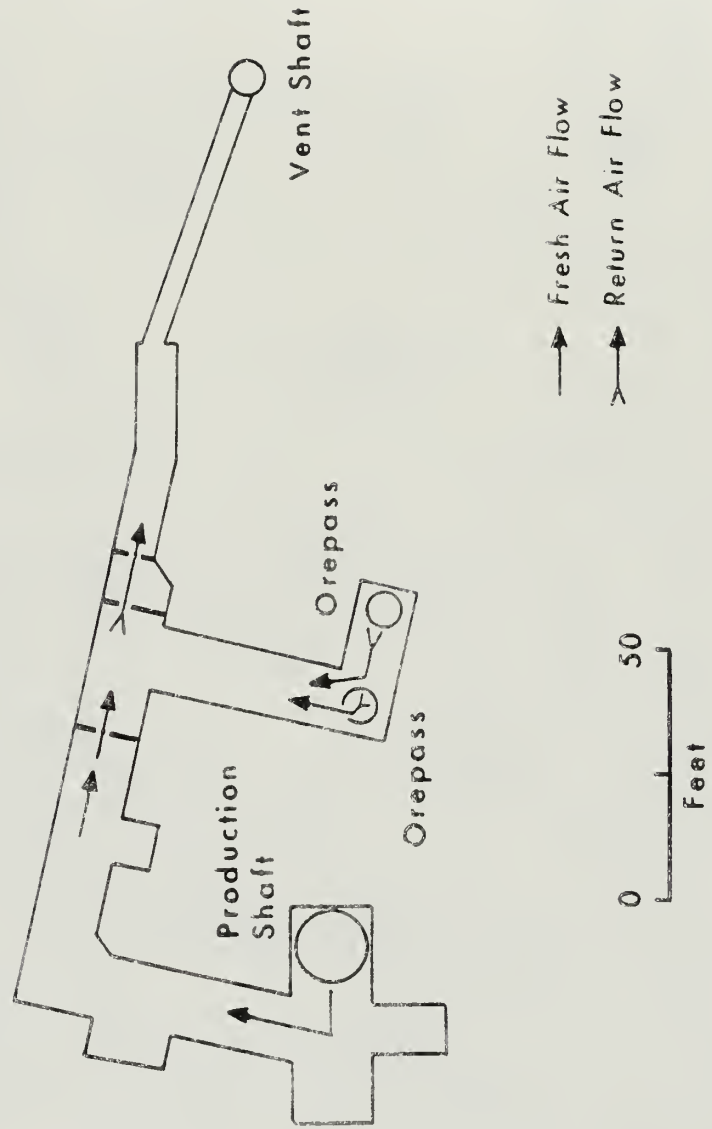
'E' Level Design and Ventilation Plan (Inactive)
